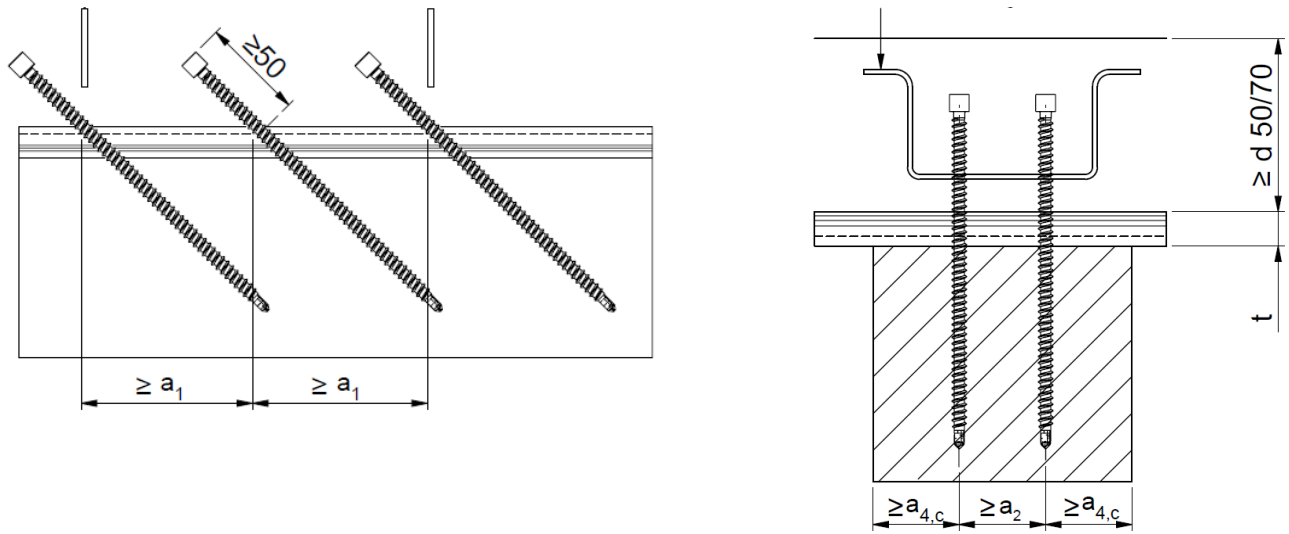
Elevation on (left) and cross-section through (right) a composite member with ASSY plus VG screws
